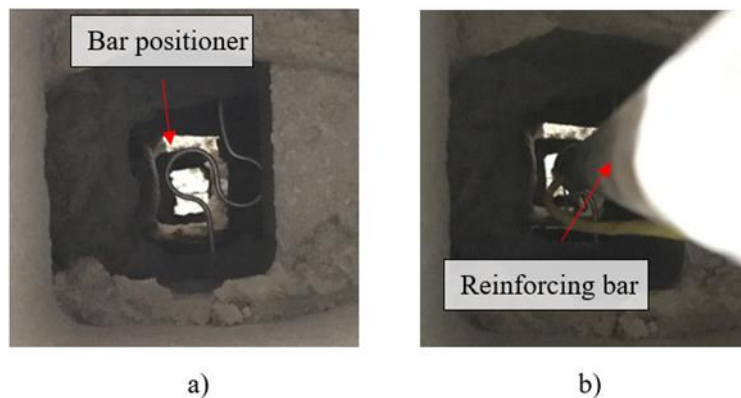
Bar positioners to maintain the reinforcing bars within the centre of the wall cross-section during grouting: a) before placing the reinforcing bar; and b) after placing the reinforcing bar
